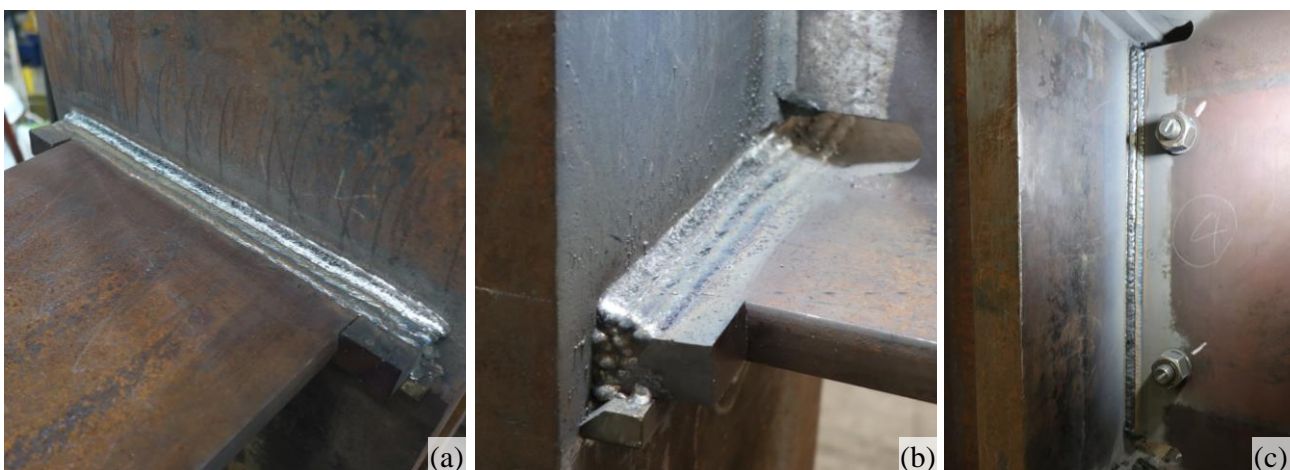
Fabrication of the beam-to-column connection – completion of CJP welding details.
